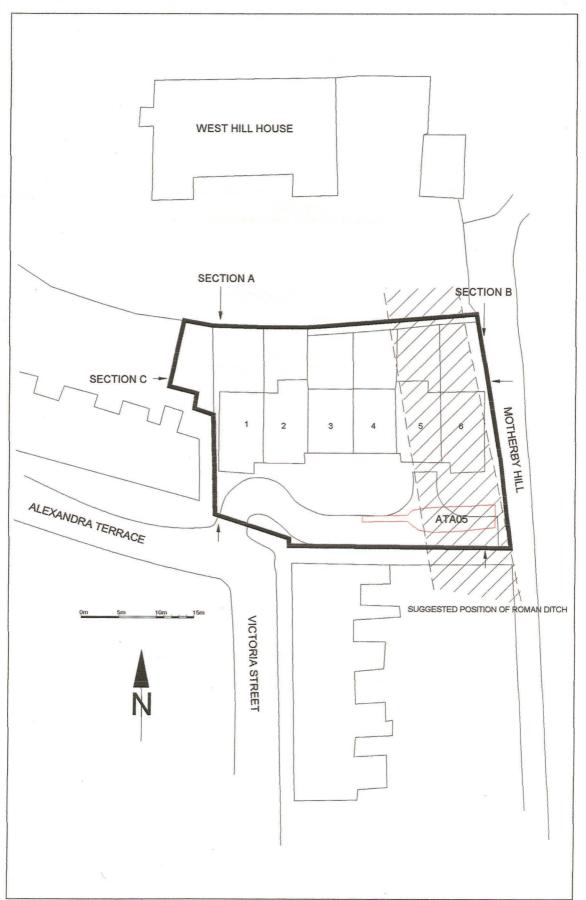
Proposed site layout with evaluation trench located (scale 1:500).
